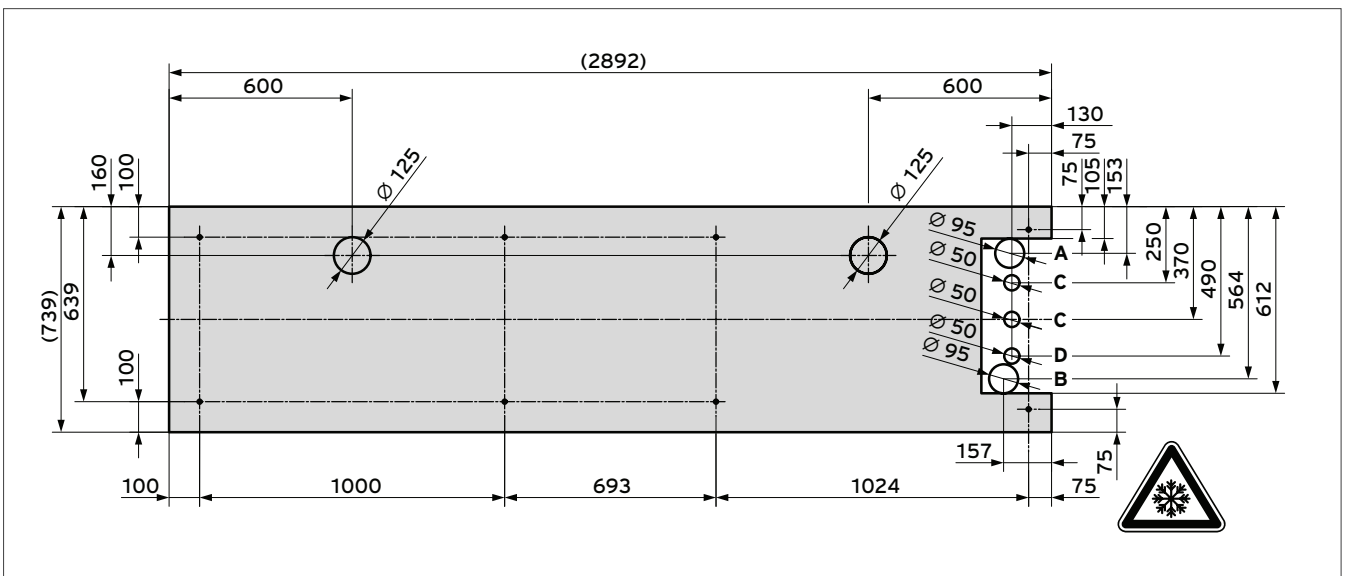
Foundation of the connection dimensions for two aroCOLLECT outdoor units for the installation set (0020205408) with the Tichelmann system
